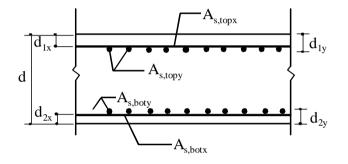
Section geometry and reinforcement parallel to *x*-direction
